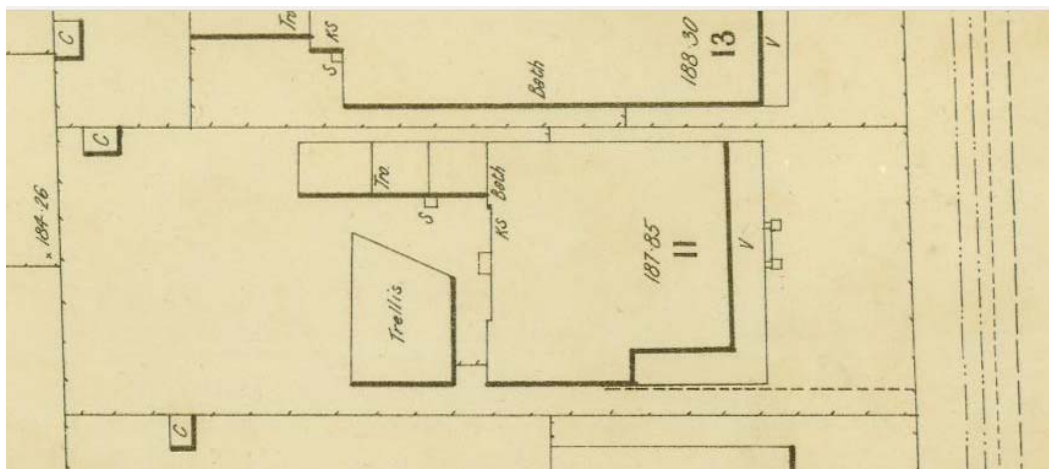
MMBW Detail Plan no. 1742, dated 1902 (source: SLV).
